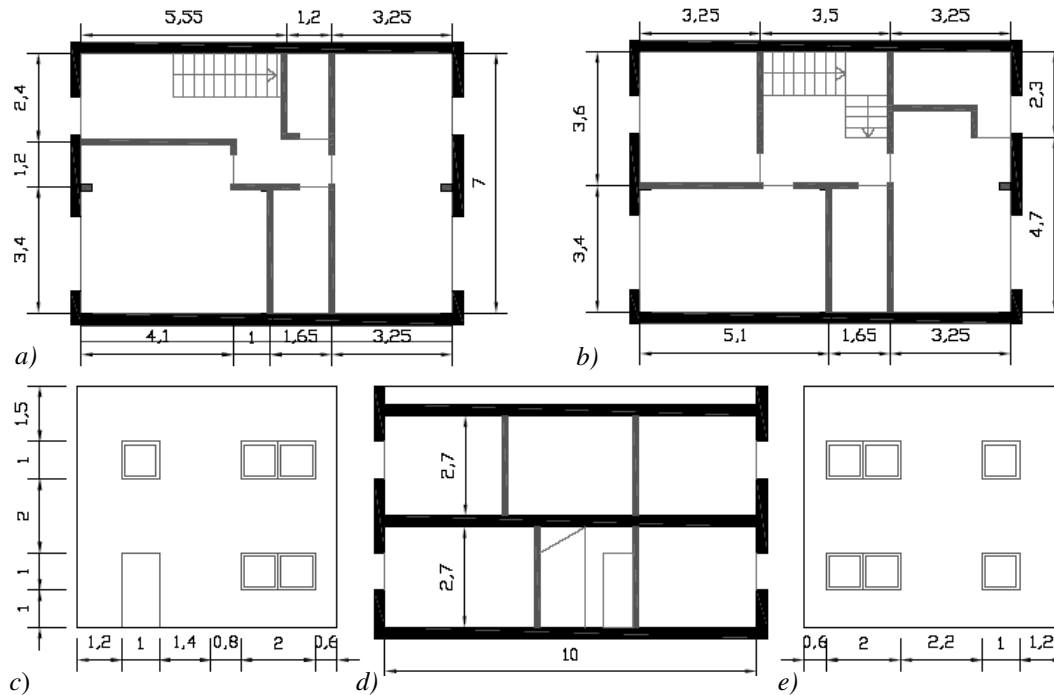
Case study plans: a) ground floor, b) first floor. Facades: c) East, e) West. Section: d)
